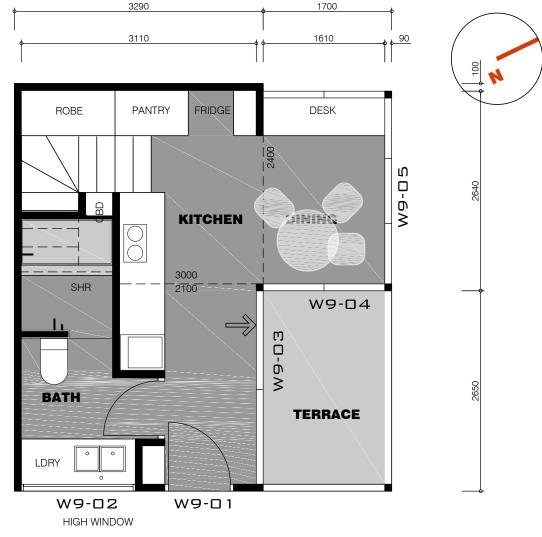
DETAILED ACCESSIBLE LODGER & COMMON ROOM
